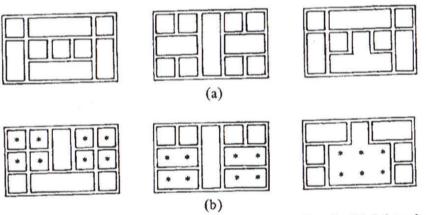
Plans shown in (a) satisfy proviso 3; plans in (b) fail to do so.
